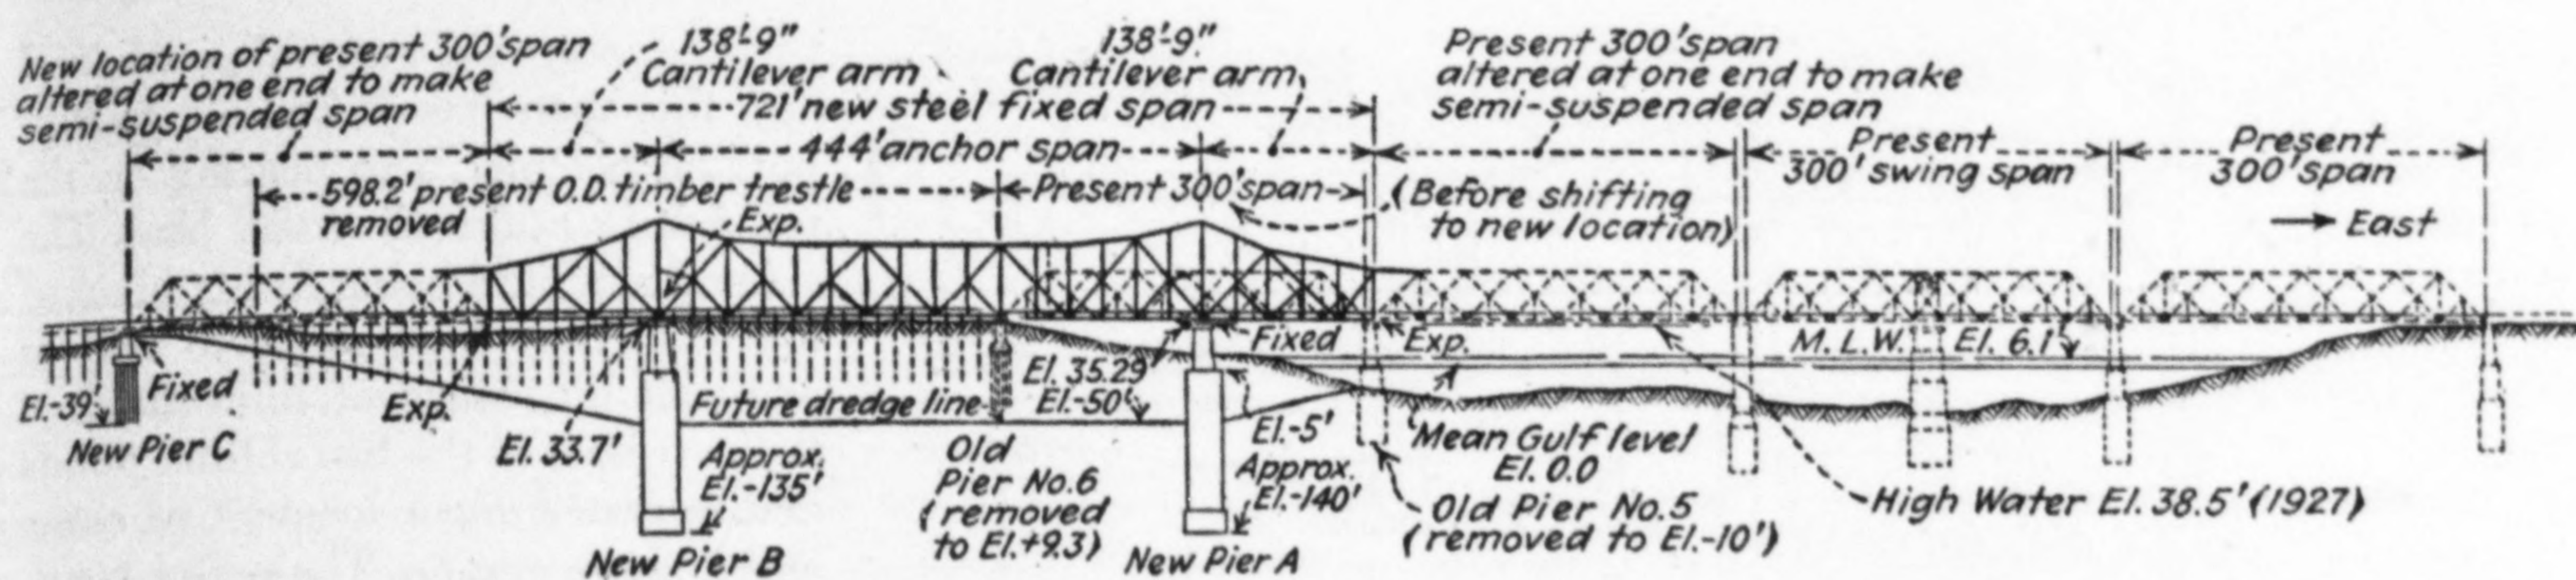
Plan of reconstruction of Krotz Springs bridge showing how an existing 300-ft. span was moved 720 ft. and utilized at the end of the new steelwork that filled in the gap.
